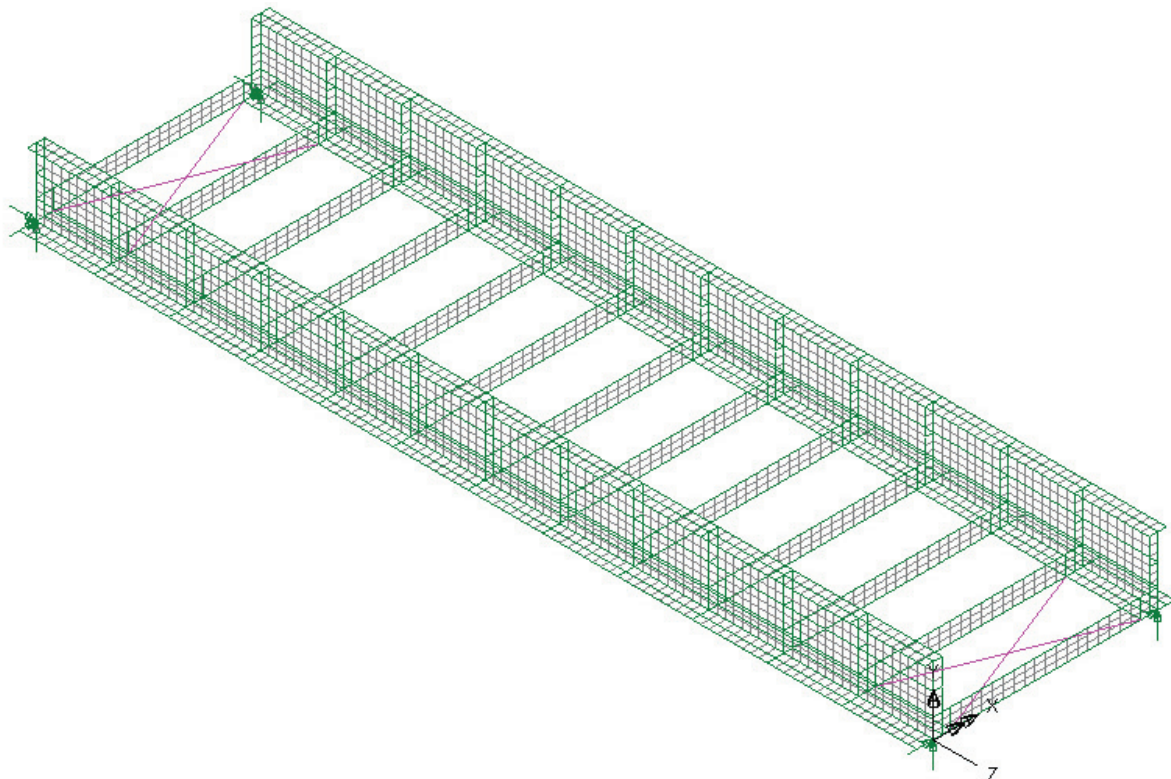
FINITE ELEMENT MODEL OF HALF-THROUGH BRIDGE
